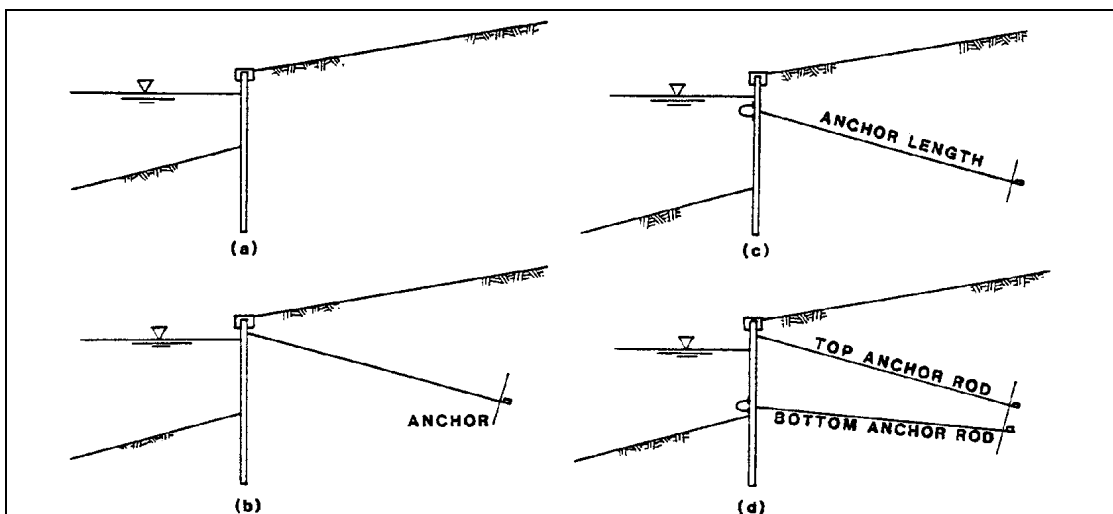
Anchorage schemes for a sheetpile bulkhead (after Brown 1985).
